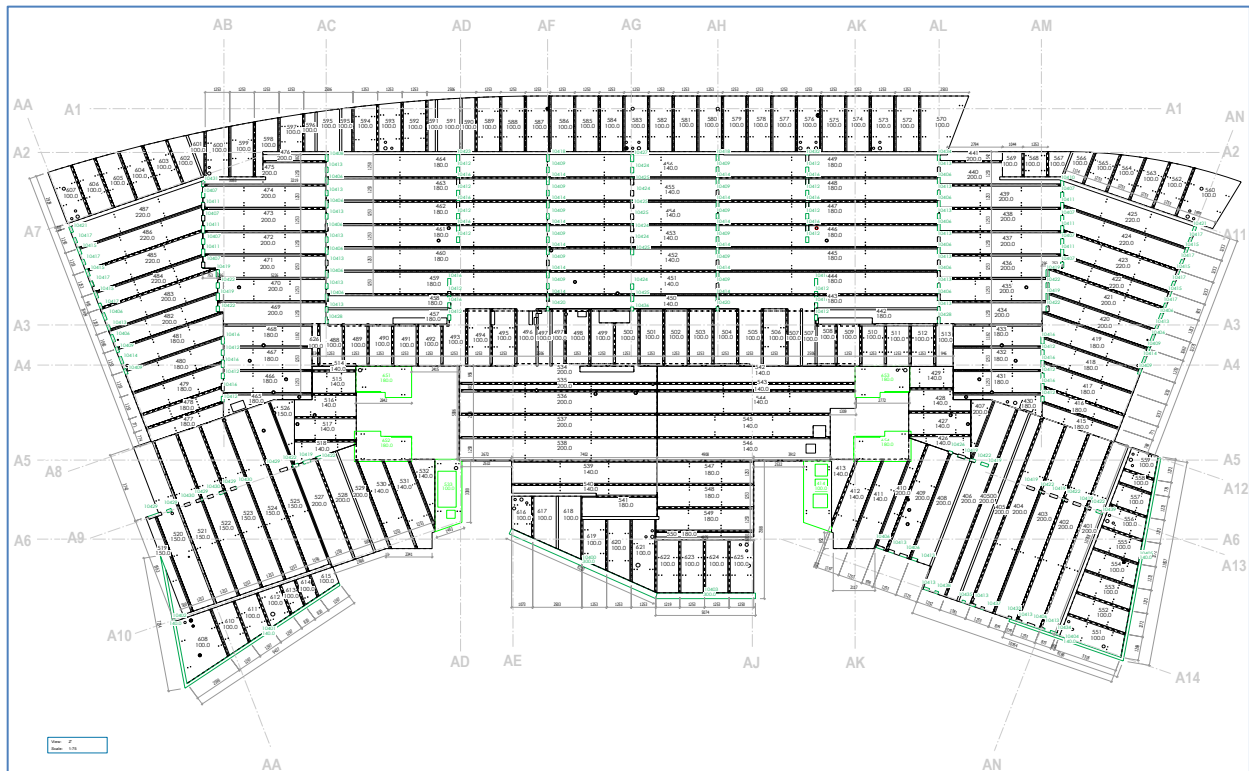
Indicative floor panel layout from a multi-storey residential building project (Source: Strongbuild P/L)
